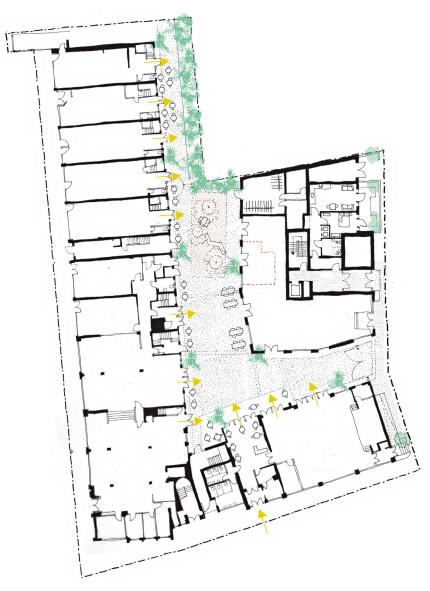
Central Parade phase 2, proposed floor plan for the backside  $\,$
